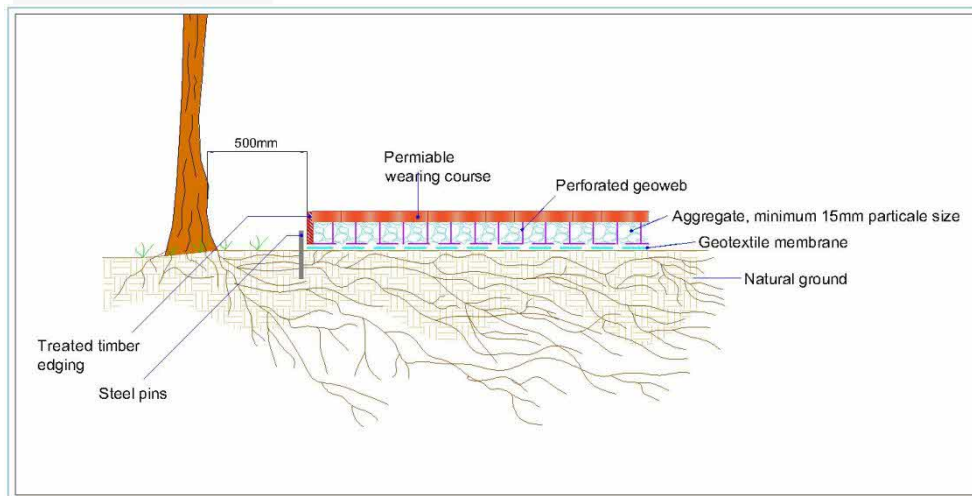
Typical cross-section for multi-dimensional confinement system using timber edging
